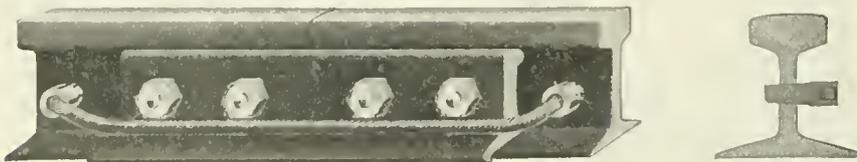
REMOVABLE BOND, INSTALLED AND SECTIONAL VIEW
